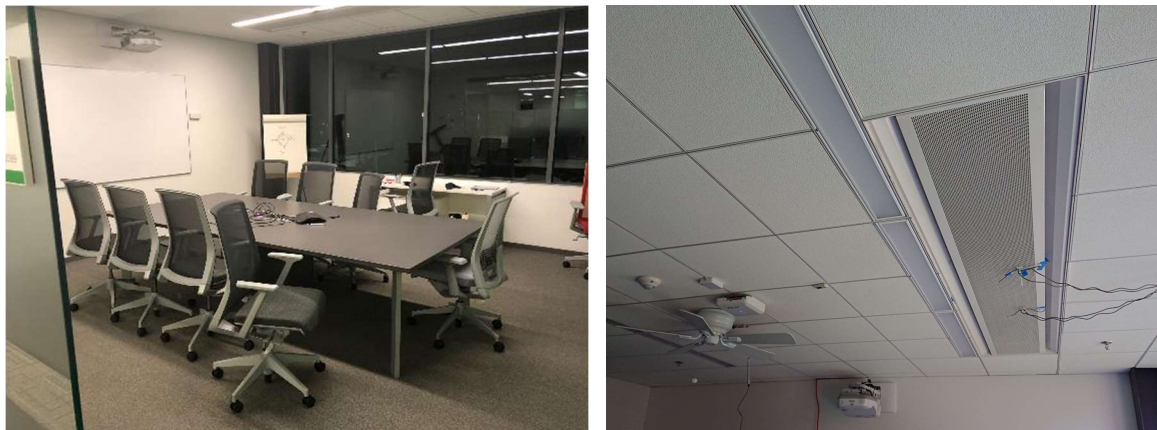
(Left) Conference room arrangement and (Right) ceiling arrangement showing fan and active chilled beam placement
